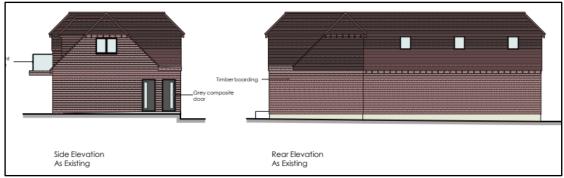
GARAGE BUILDING SIDE AND REAR ELEVATION (KENT BUILDING COTNROL)
